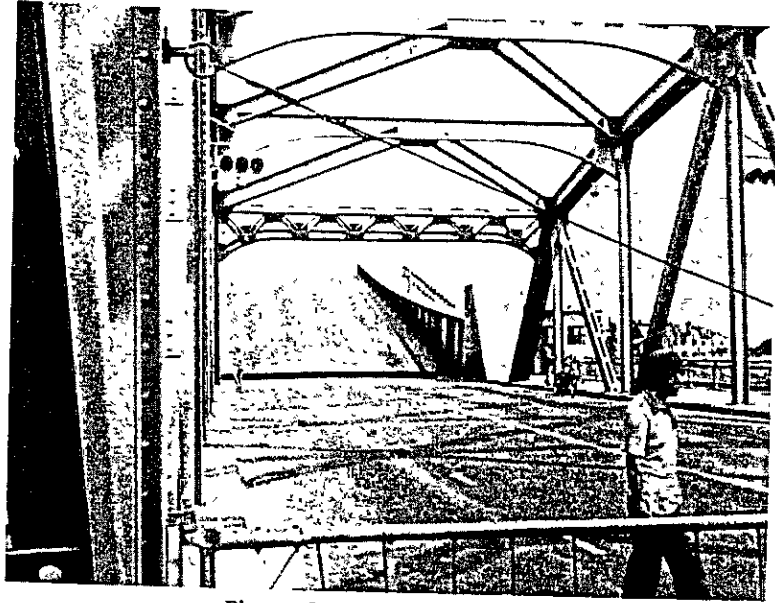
Pavement on the Construction Joint of the RC Slab
